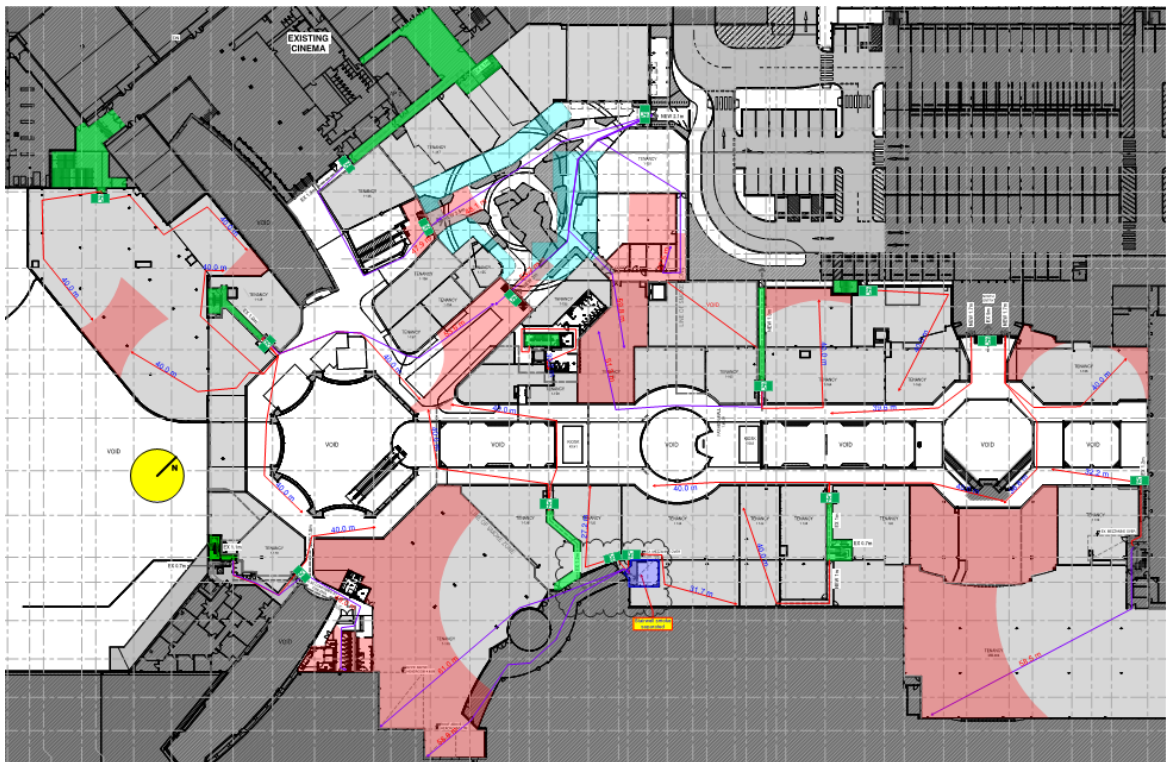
Travel distances to the nearest of alternative exits on First Floor
